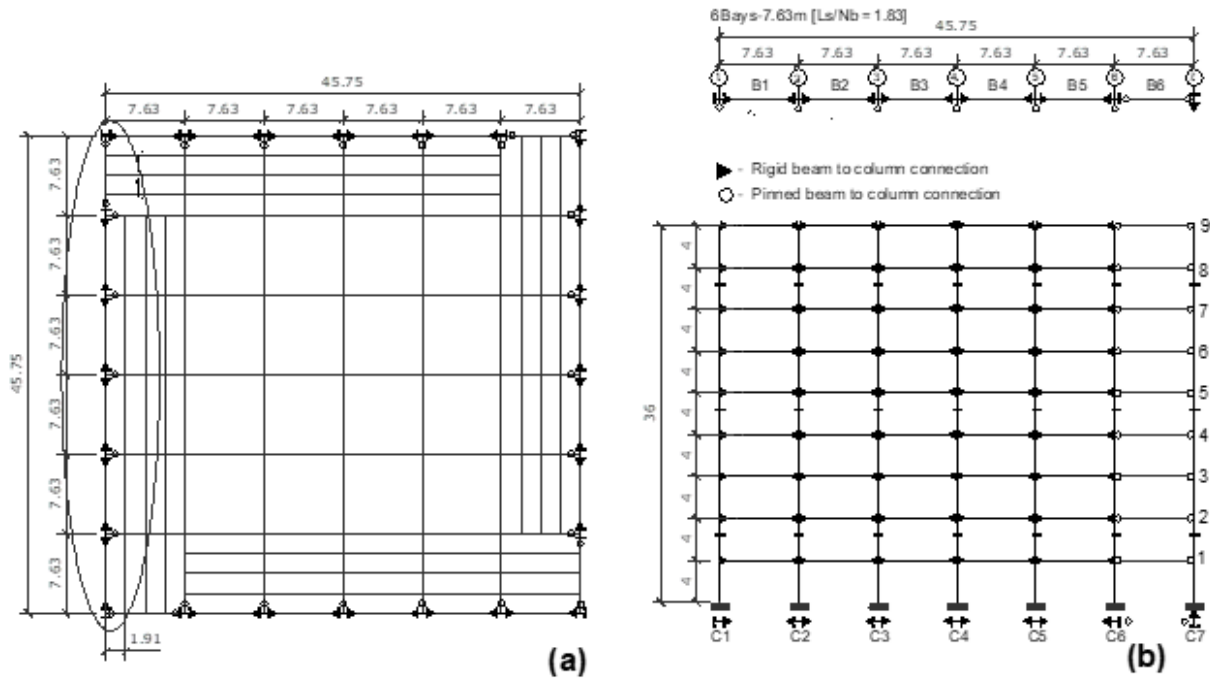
6 Bays perimeter MRFs (a) Typical floor plan and (b) elevation.
